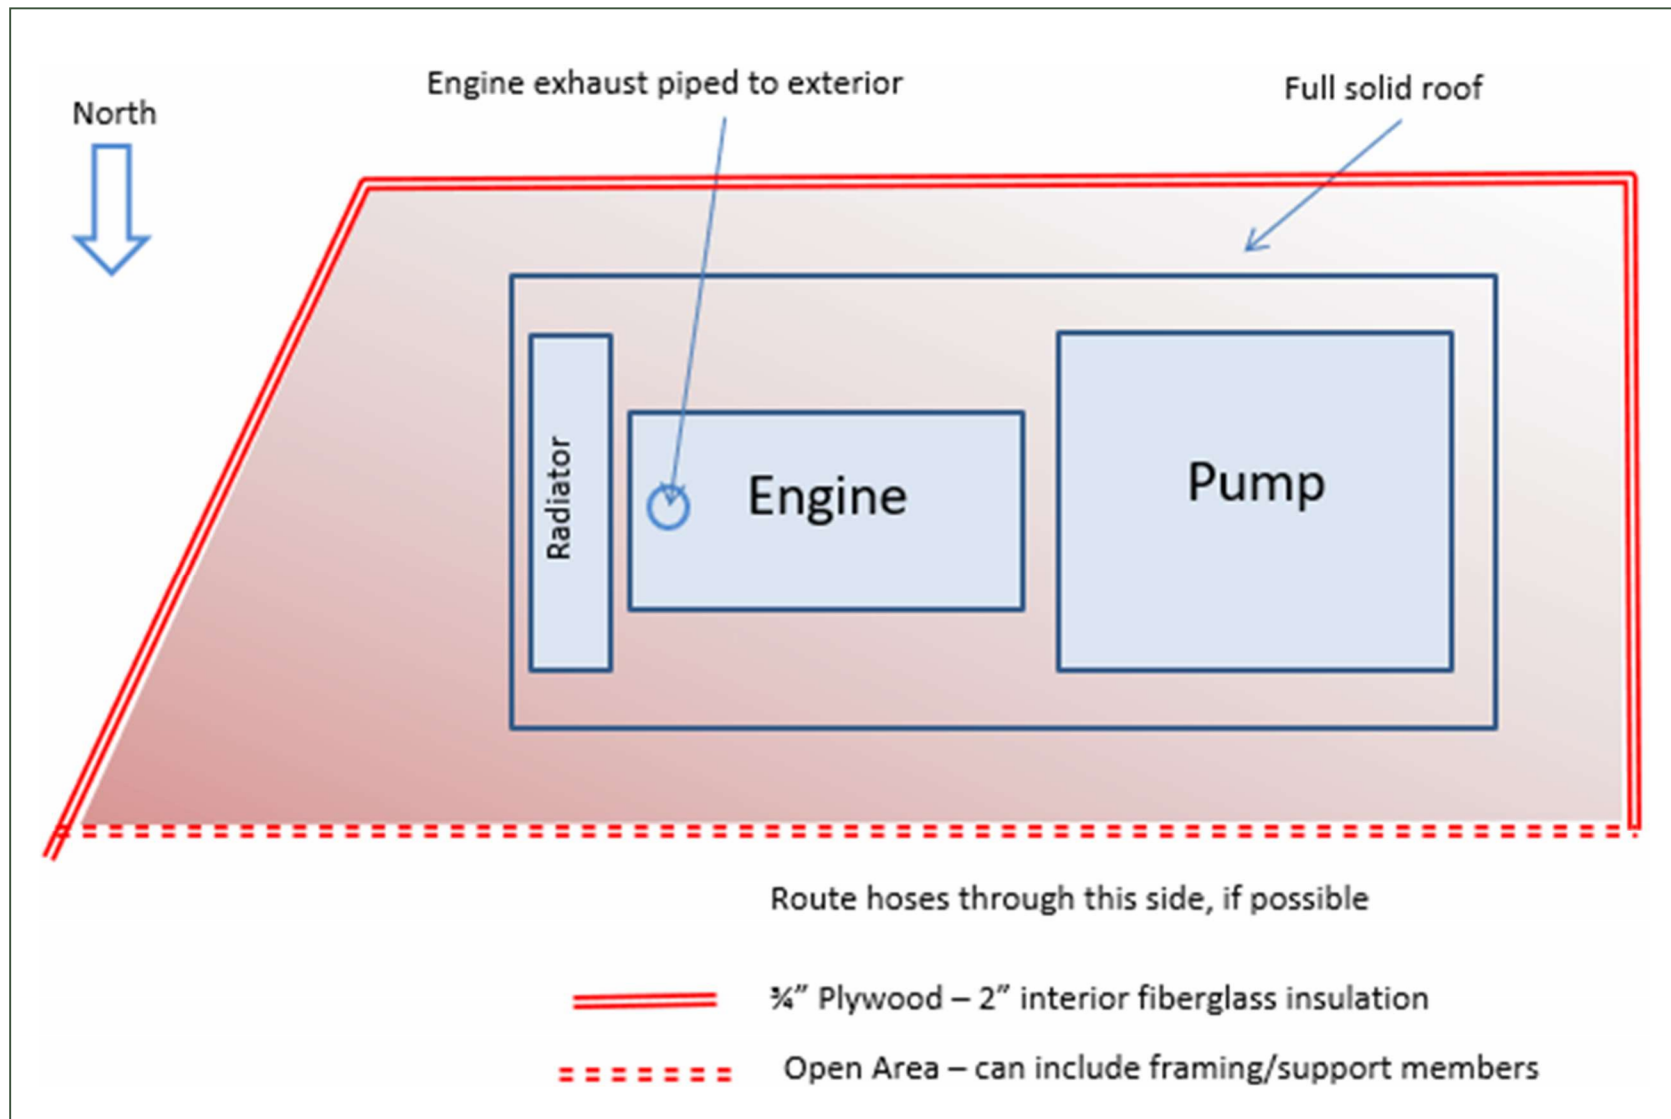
Typical Enclosure Layout for Diesel Powered Pump or Welder Equipment Axis Oriented East/West
